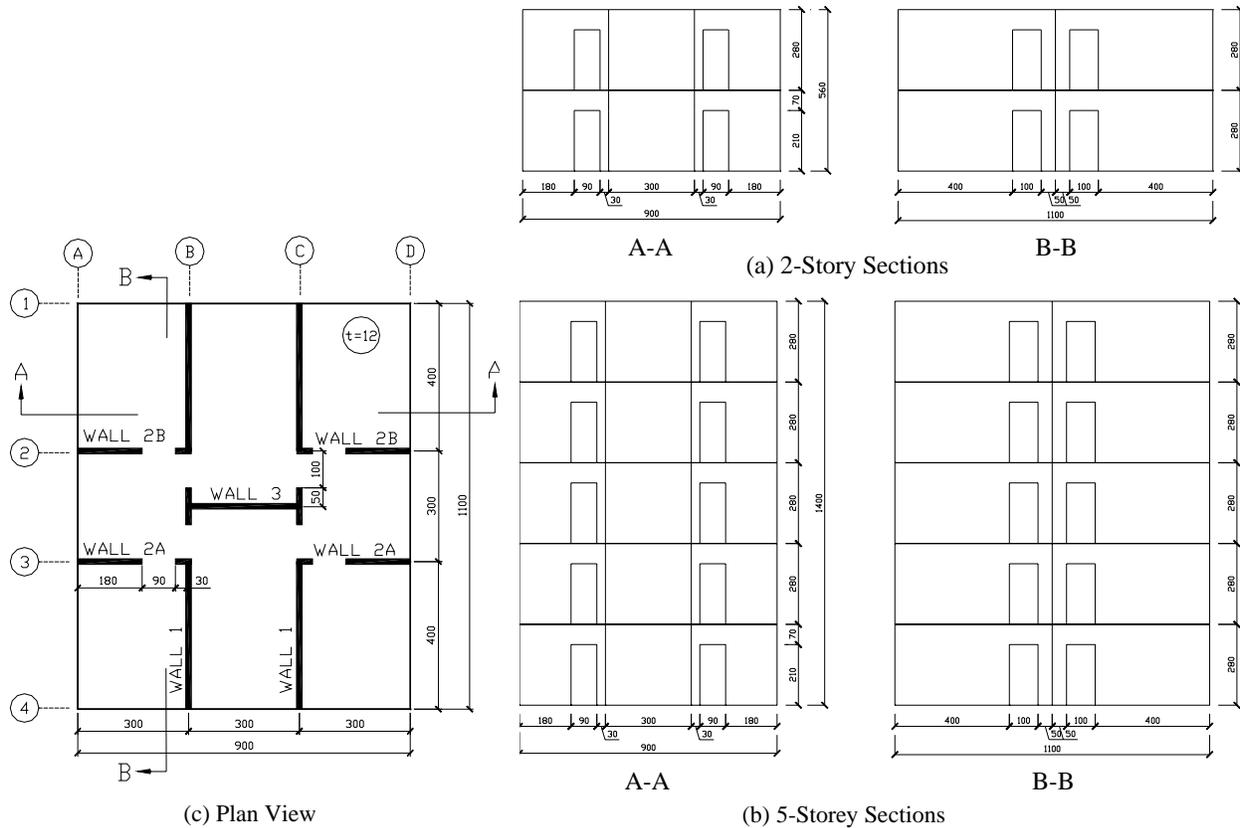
Typical architectural plan and section views of the 2 and 5-story buildings (units are in cm)
